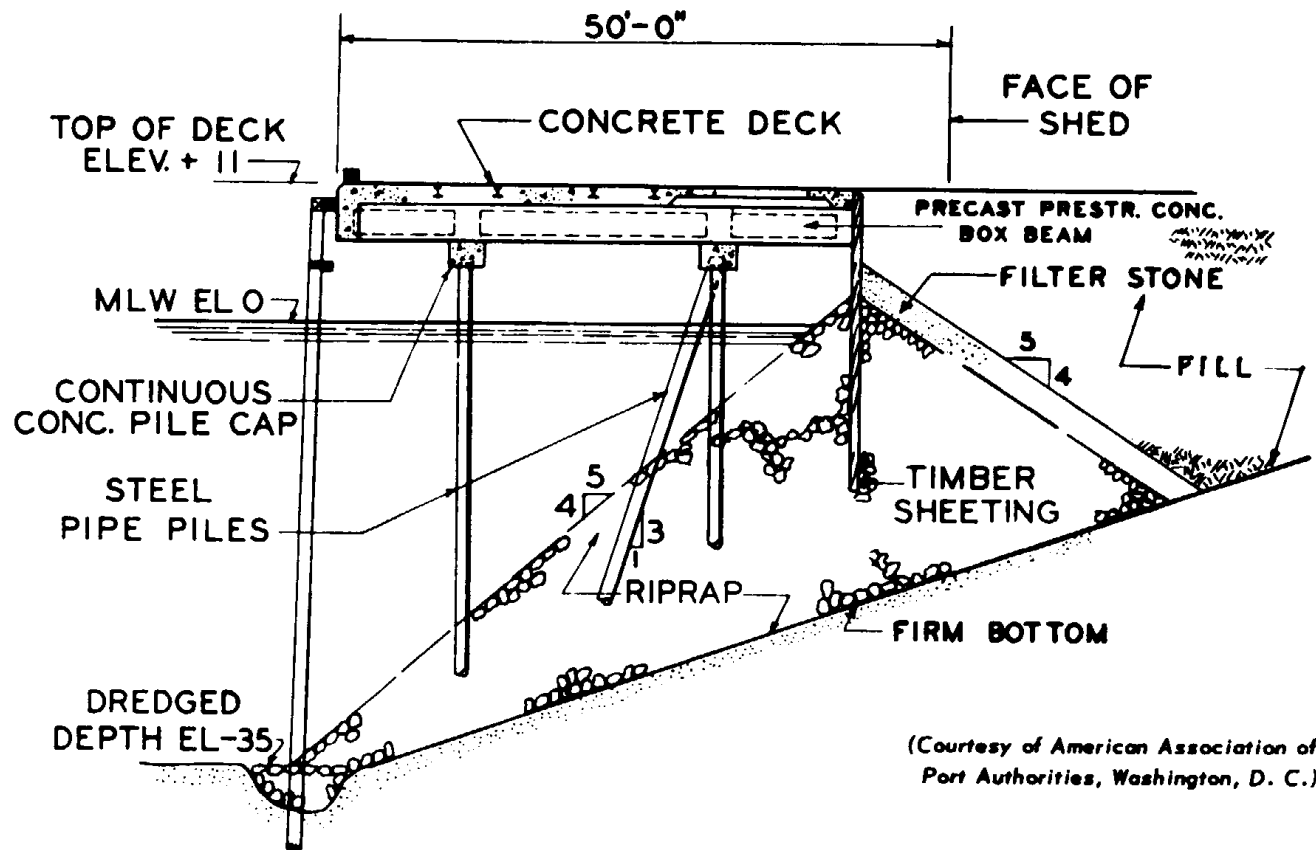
High-Level Open-Type Wharf Construction with Concrete Deck on Prestressed Concrete Beams-Steel Pipe Piles.
